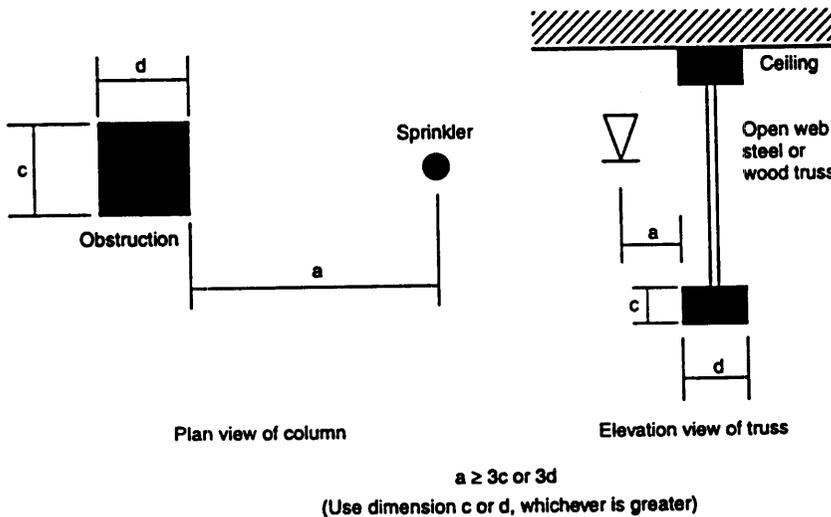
Minimum distance from obstruction (ESFR sprinkler).
